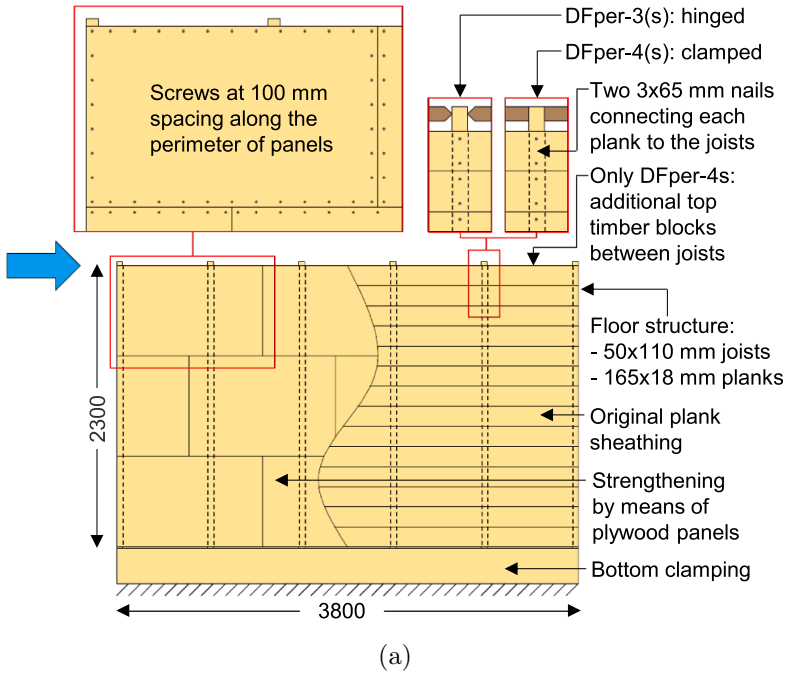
Schematic representation of the diaphragms tested perpendicular to the joists (specimens DFper-3 and 3s, DFper-4 and 4s, view from decking side); (b) sample DFper-3 positioned in the test setup.
